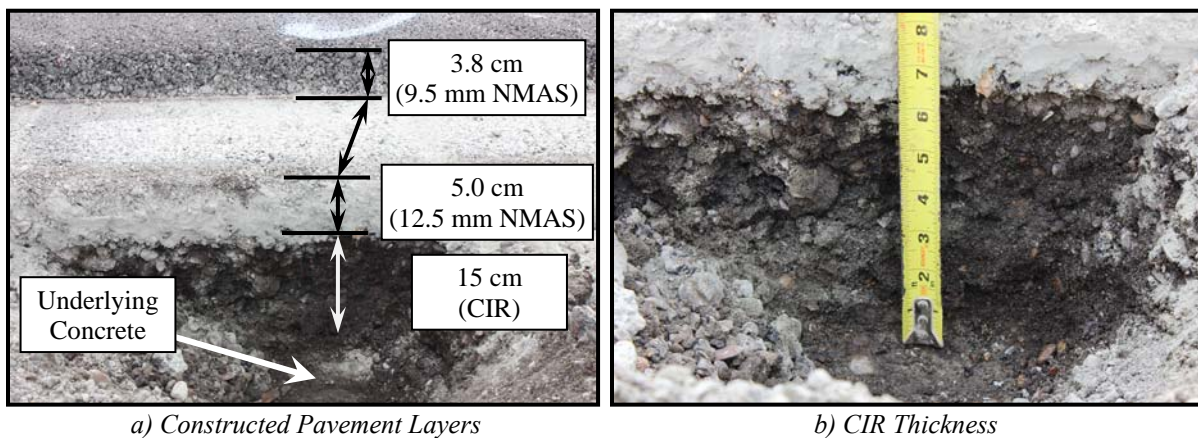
Final US-45Alt Pavement Layers (Northbound Outer Lane)
